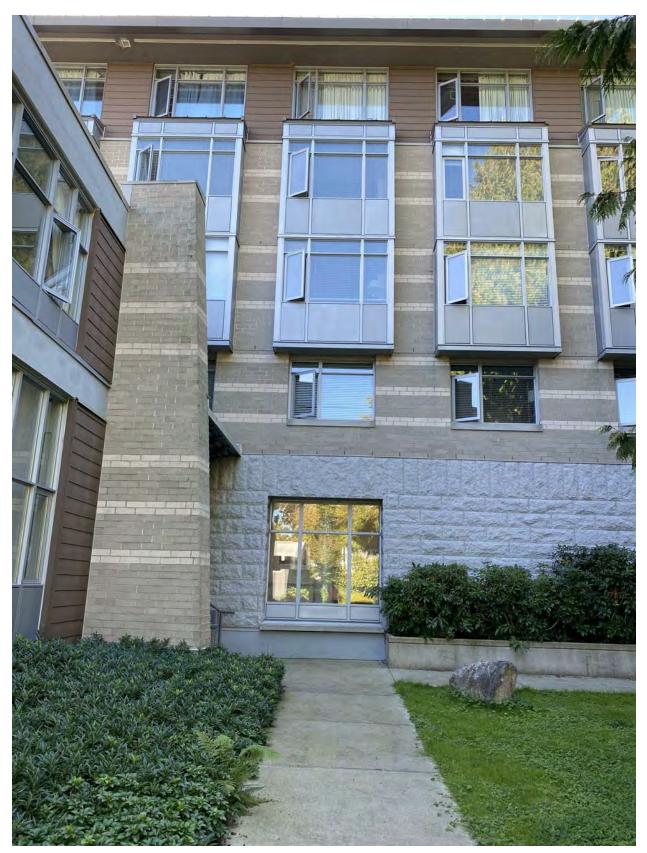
Carey Hall (Existing 2005 Building) - Typical Bays at Interior Courtyard
